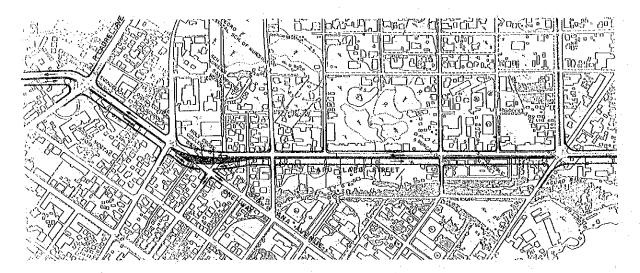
Planned Route (6-lane Road: Sta. Ana Ave.-Lapu-Lapu St. Section)
